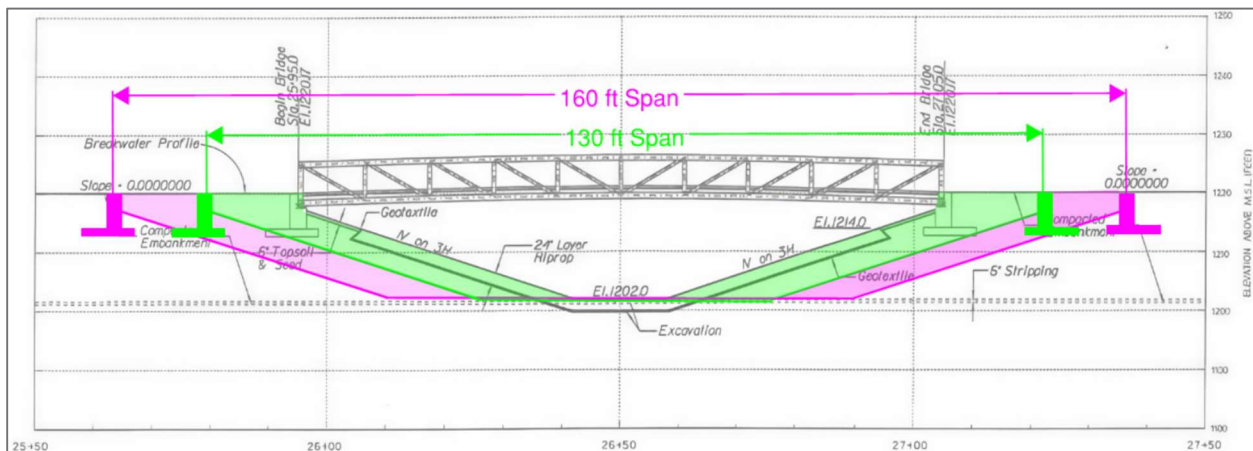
Breakwater as-built plans with channel modifications and bridge span requirements
